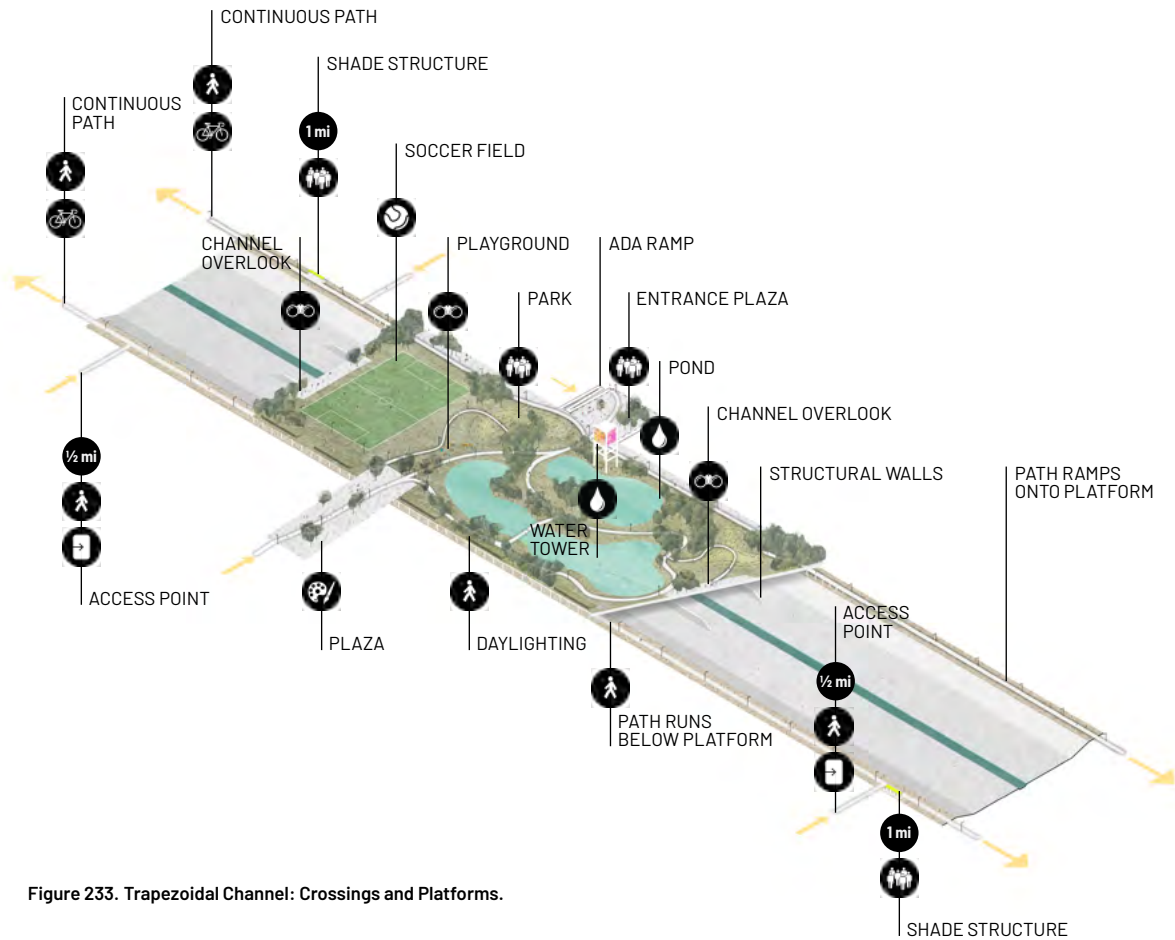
Trapezoidal Channel: Crossings and Platforms.
